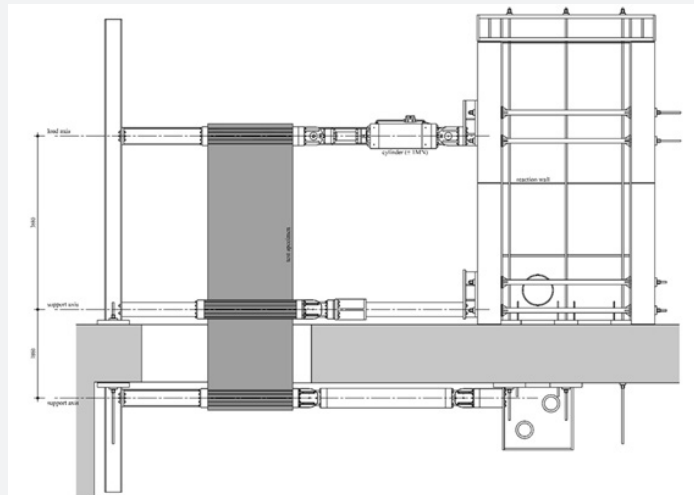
Side view of the test stand with the test specimen (in dark grey), strong floor, reaction wall (above) and steel shear wall (below).
